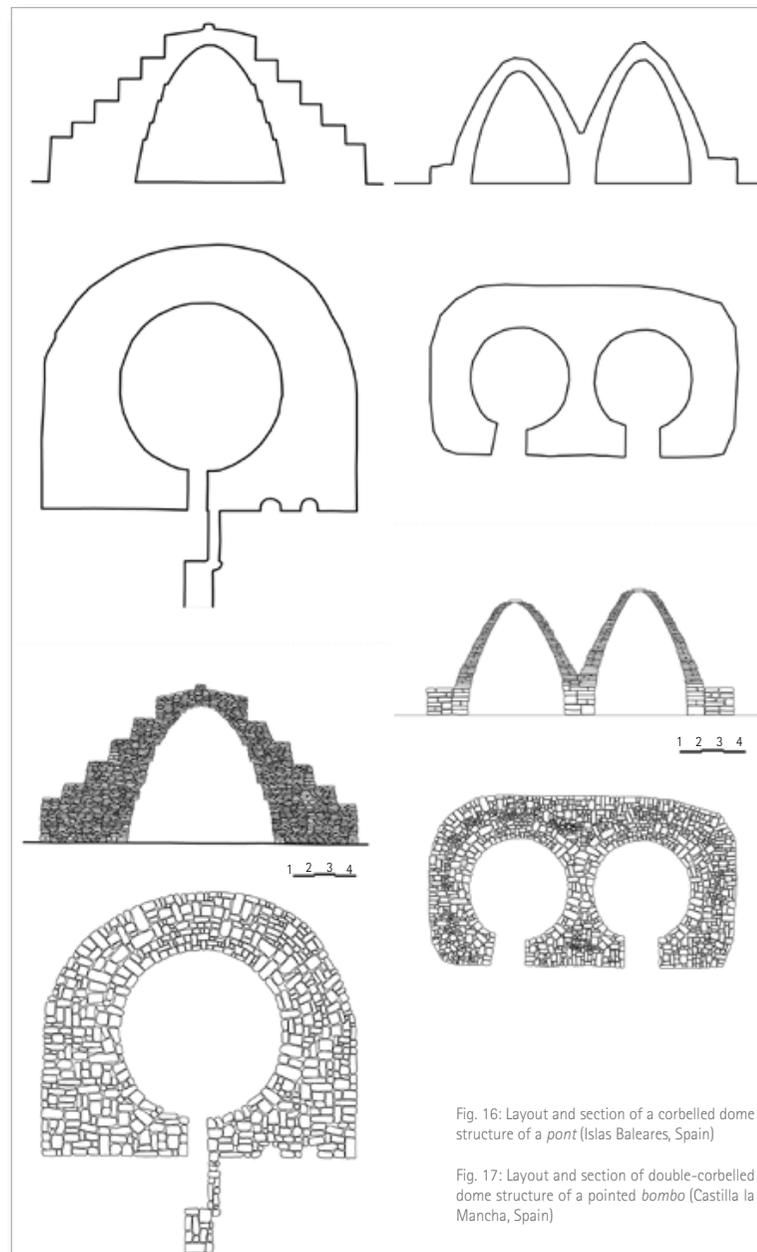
Layout and section of a corbelled dome structure of a *pont* (Islas Baleares, Spain)
